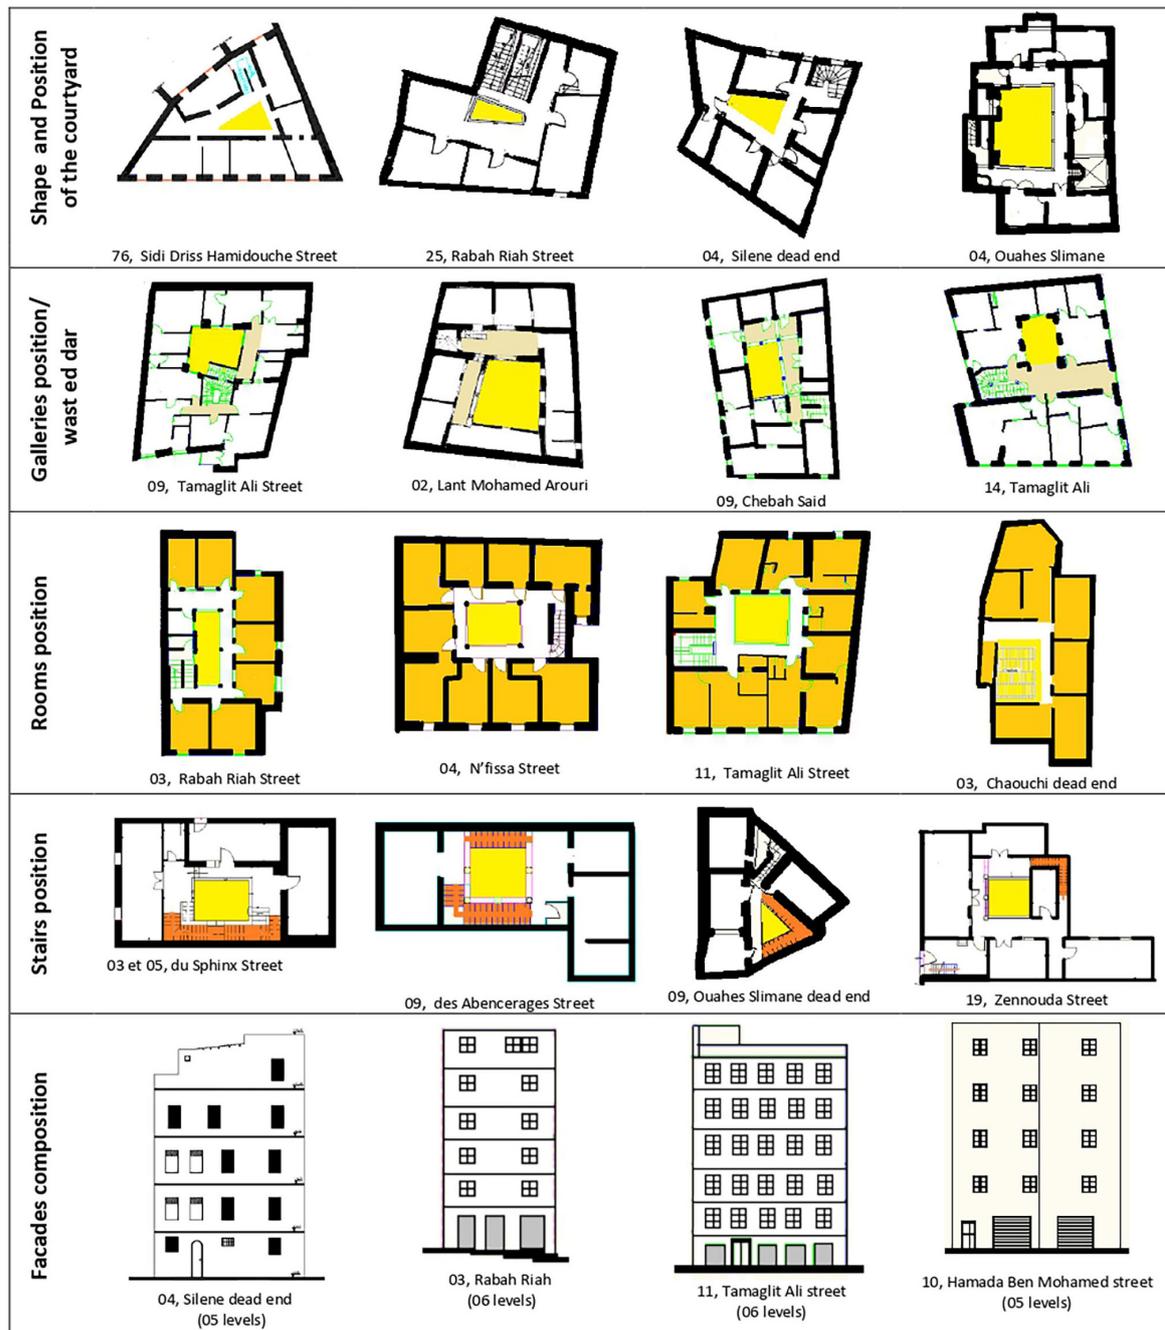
The layout of the second category of the colonial houses «Apartment building».
